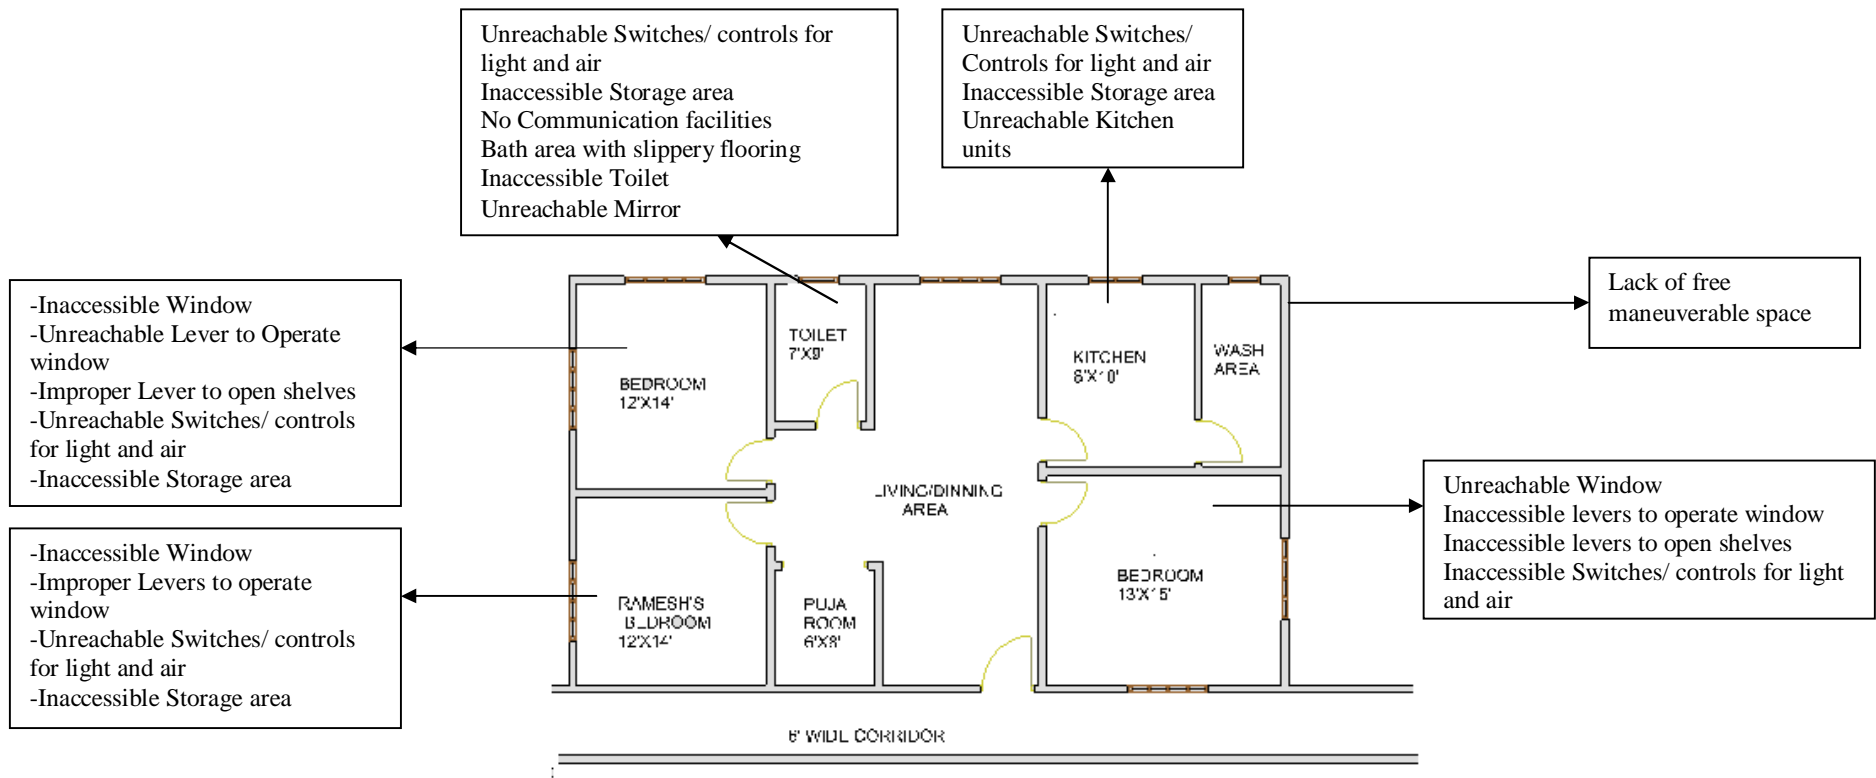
House layout of Mr. J.Ramesh with the problem areas and features
